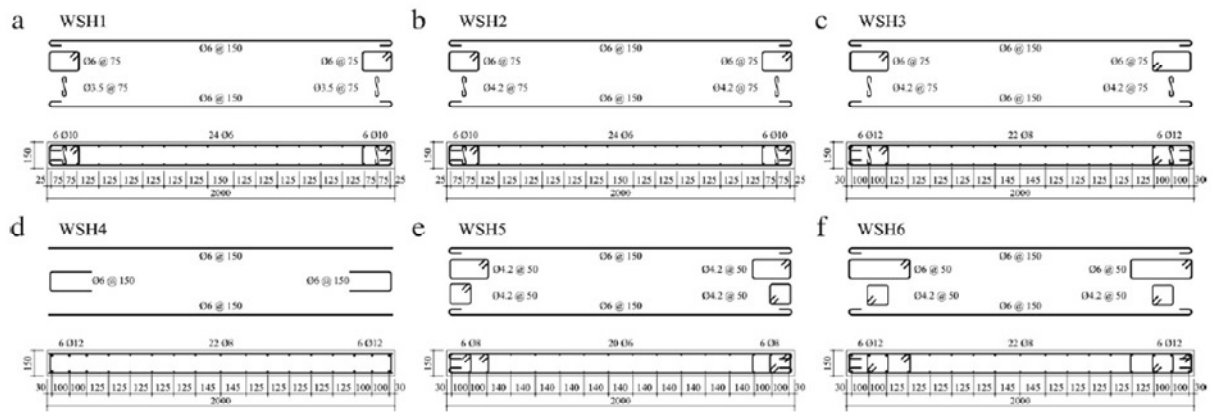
Reinforcement layout in the plastic zone of the test units (All dimensions in mm) (Dazio et al. (2009))
